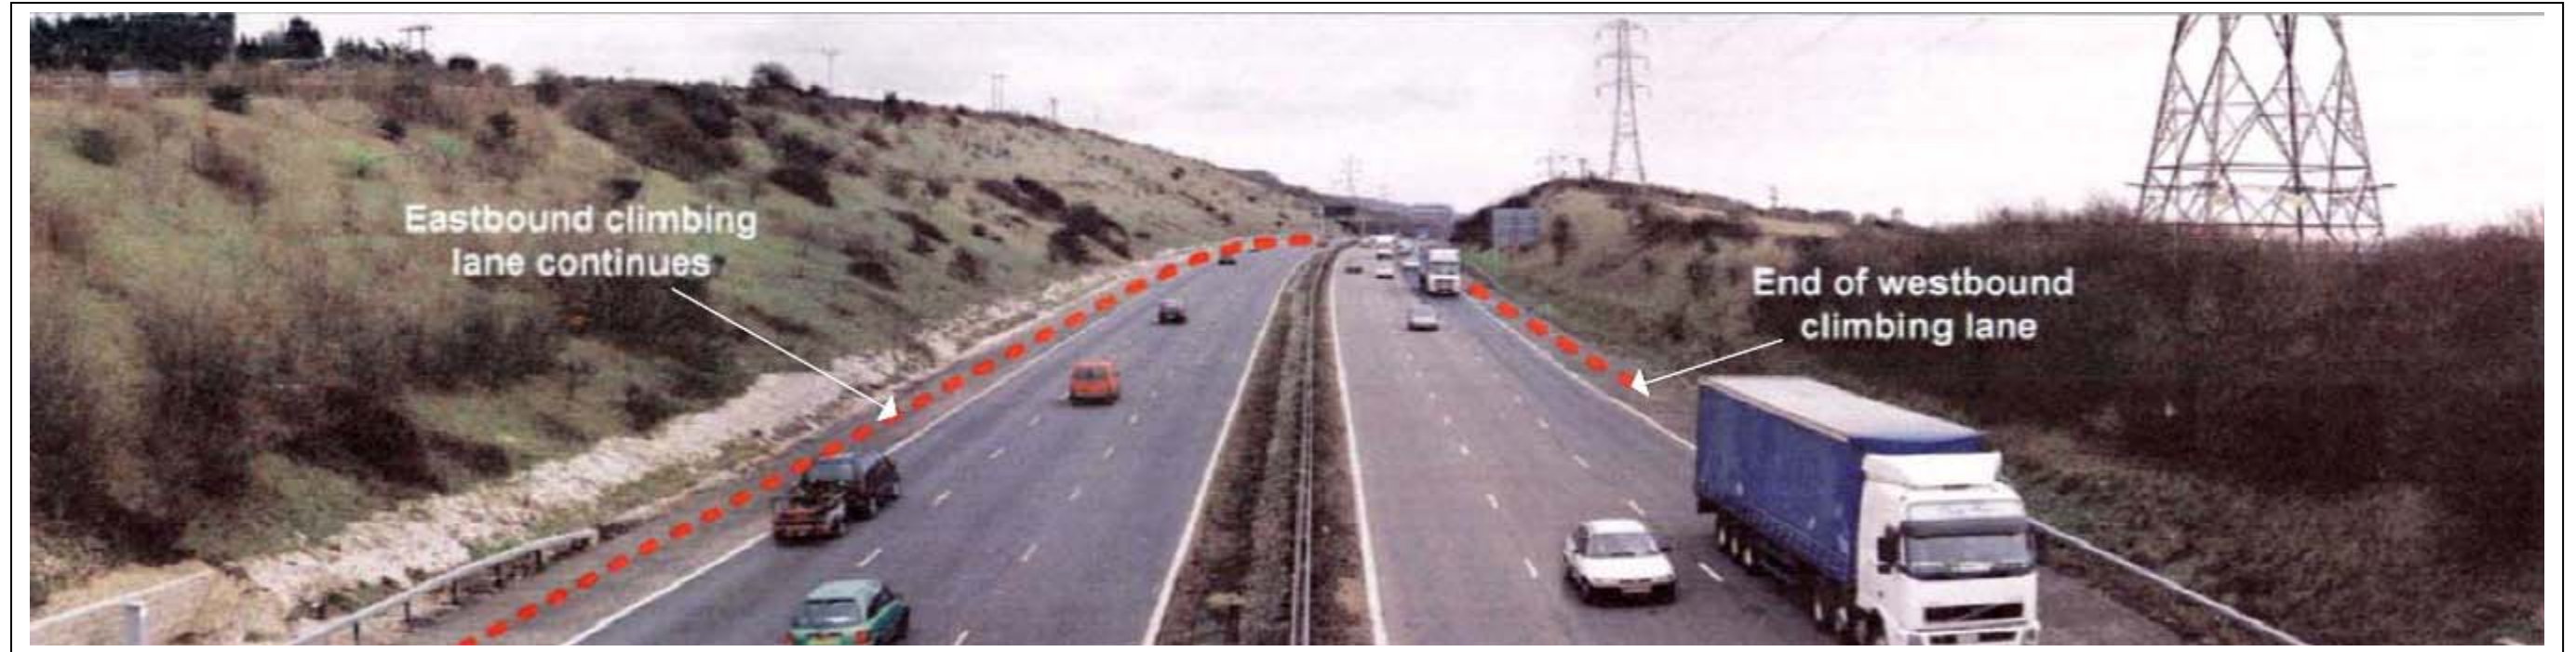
ES Figure 9. 4b – Viewpoint C[2]: Hill Road Overbridge looking east - Winter
